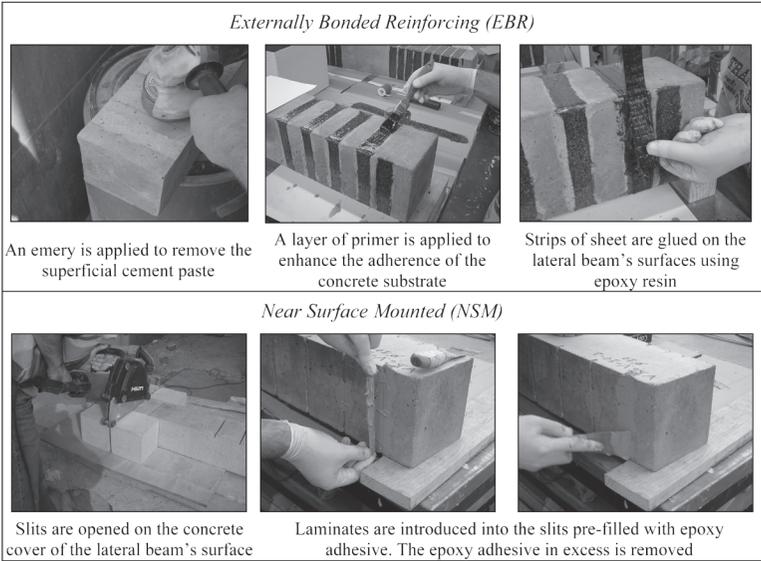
Techniques for the shear strengthening of reinforced concrete beams
